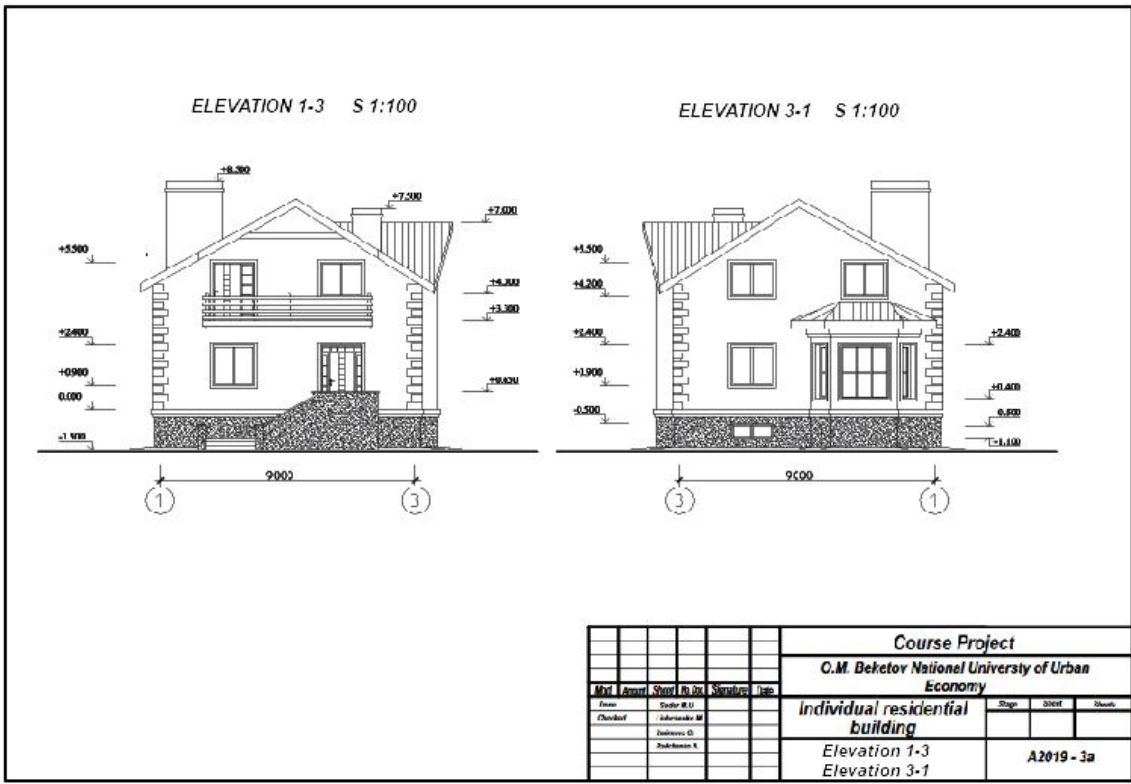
Example of drawing of Elevation 1–3 and Elevation 3–1
